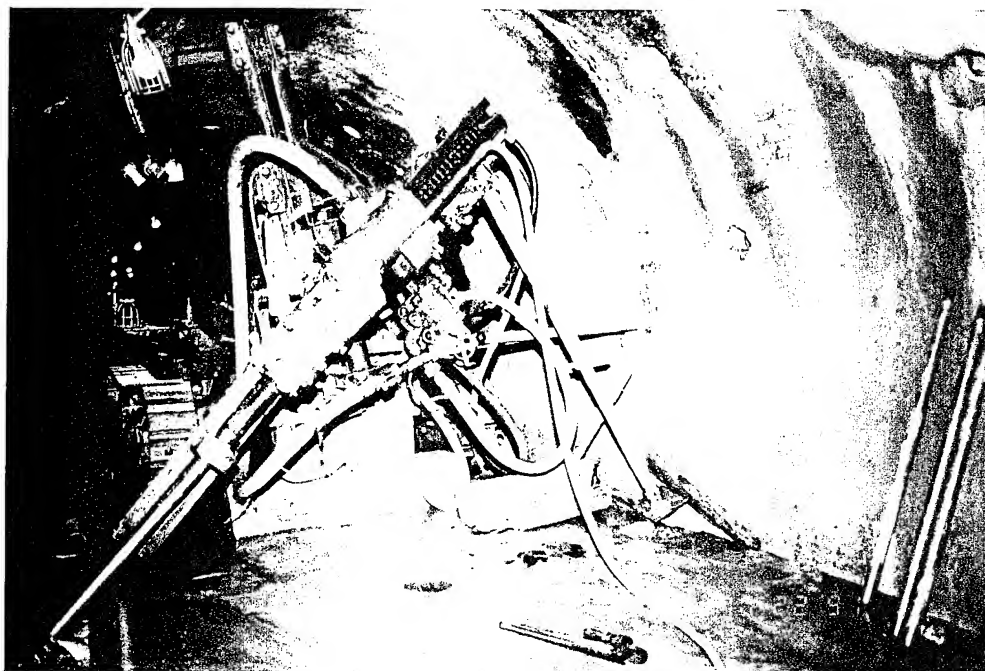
Track mounted rotary drill drilling tunnel grout holes.
